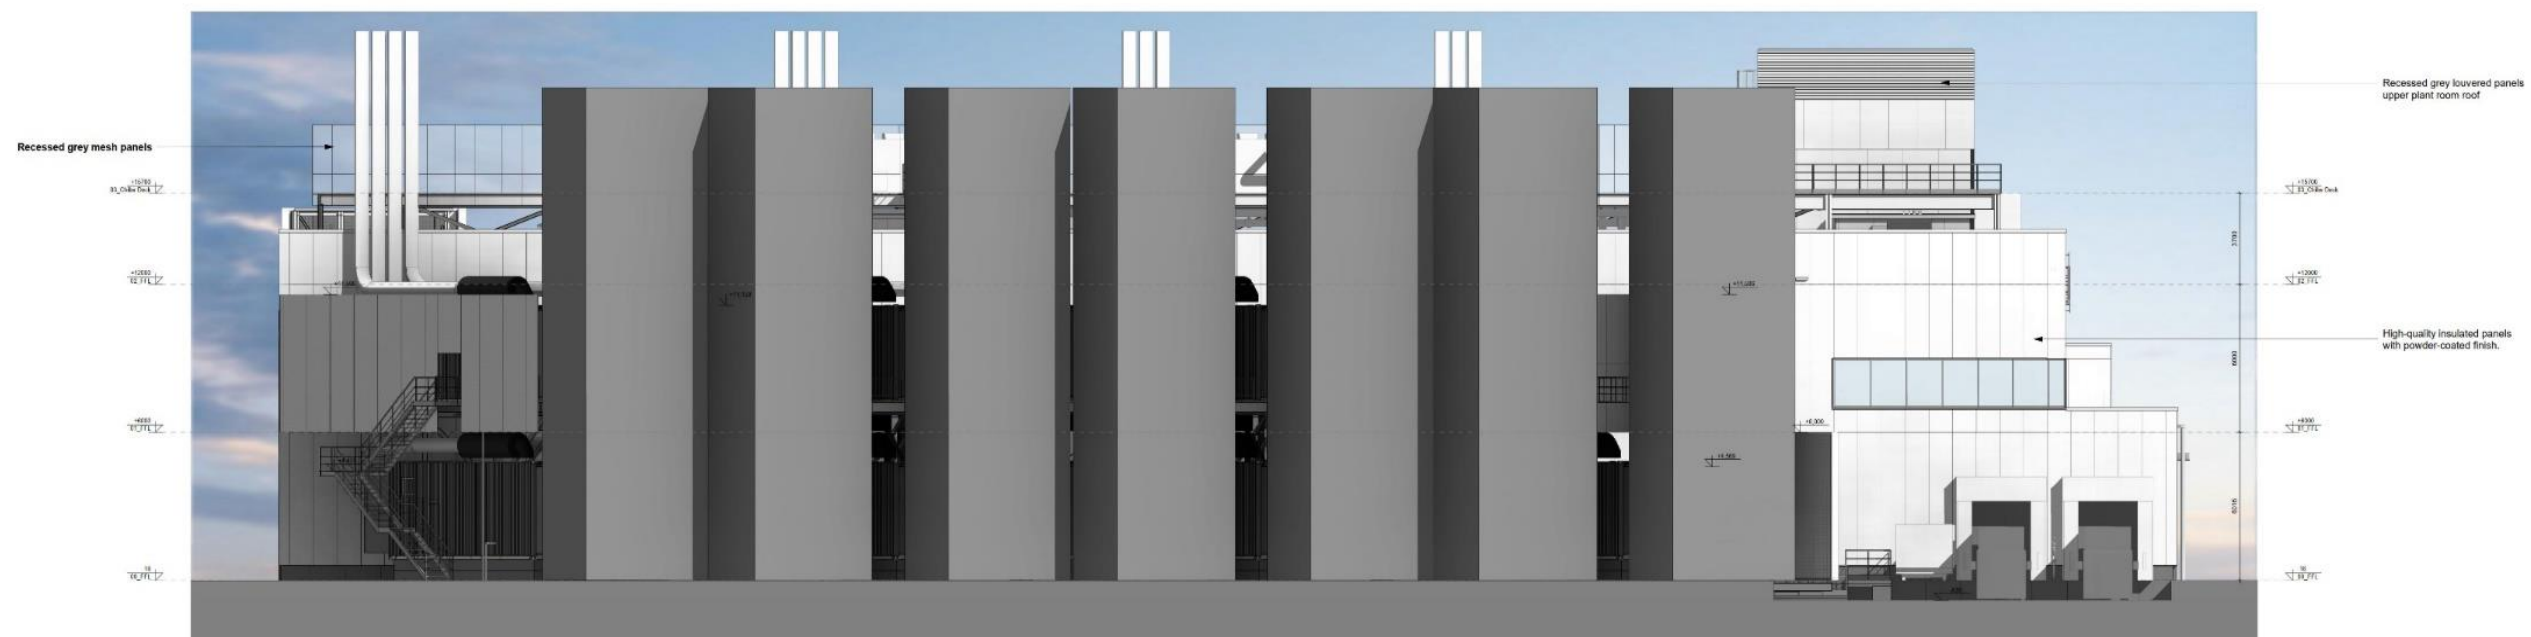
R: DUB-13 North-East and South-East Elevations (Source Burns & McDonnell)
